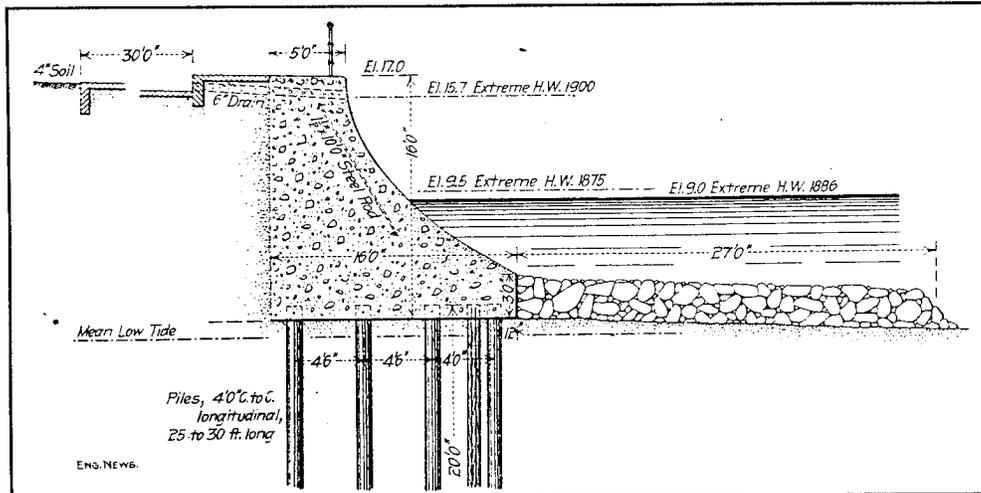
Cross-Section of Proposed Sea Wall on Gulf Side of Galveston.²
